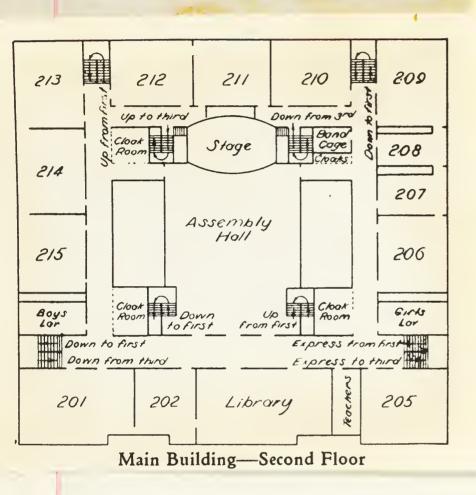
Enlarged photostat of the Main Building-Second Floor plans from the Haverhill High School Handbook.
